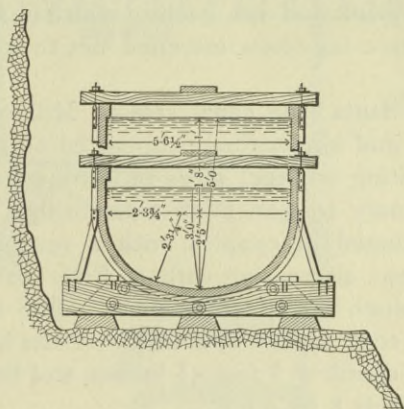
CROSS-SECTION OF STAVE AND BINDER FLUME, SANTA ANA CANAL.
